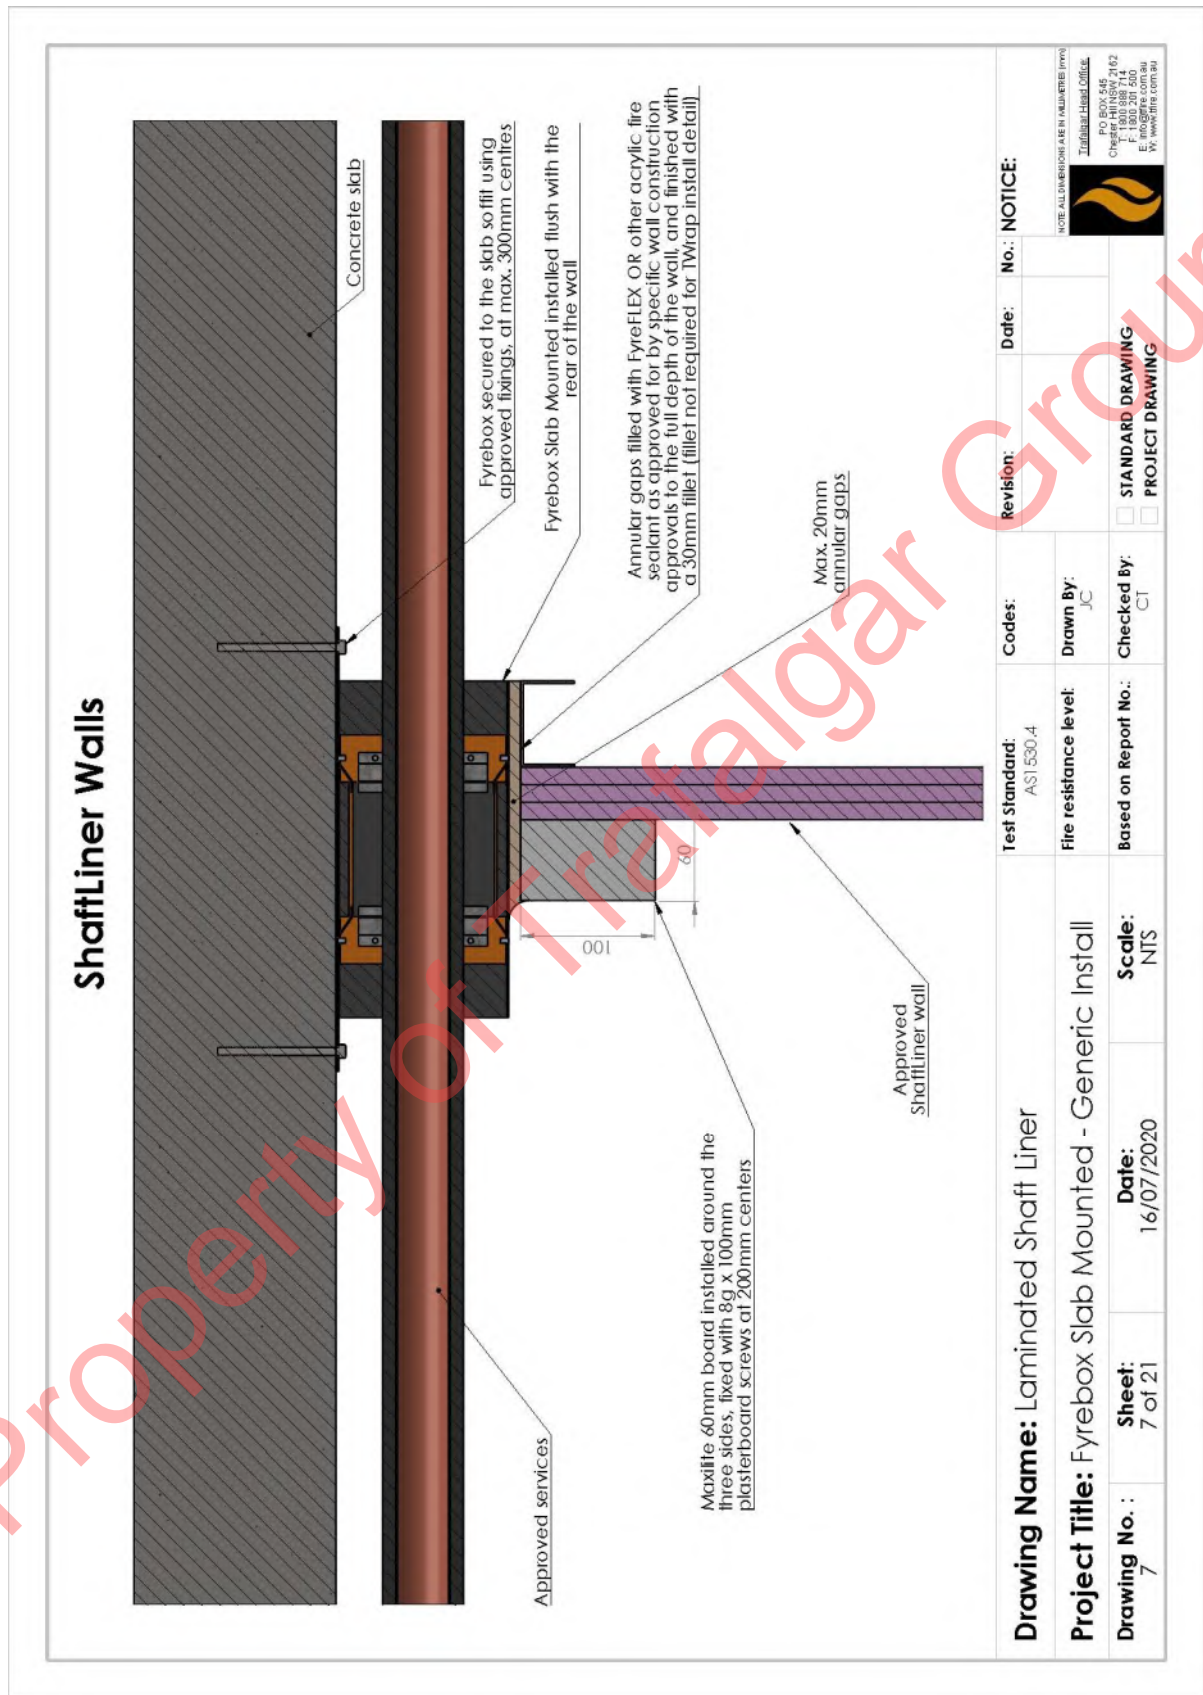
FyreBOX Slab Mount – Shaftliner walls
